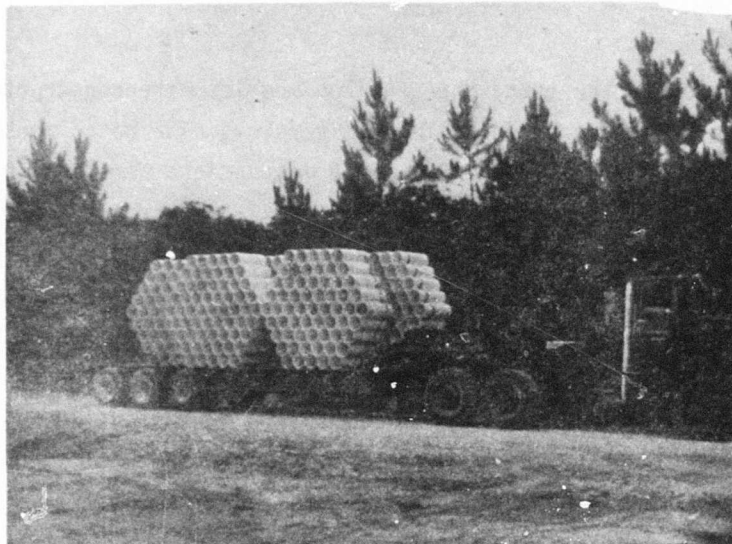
Test 2-1, PVC Modules Being Transported to the Repair Site
